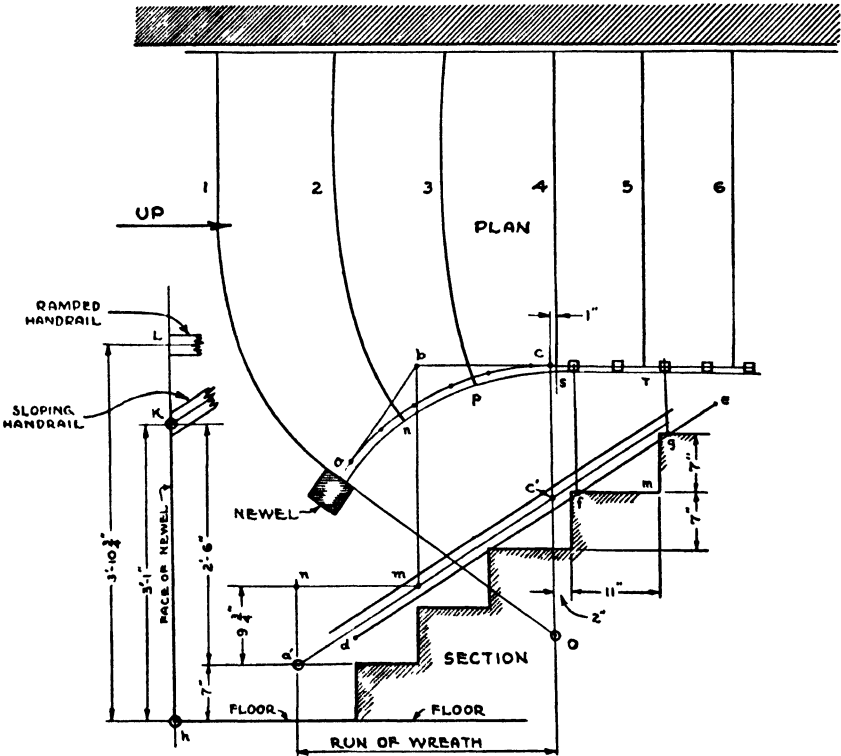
Diagram of Steps and Handrail over Obtuse-Angle Plan
